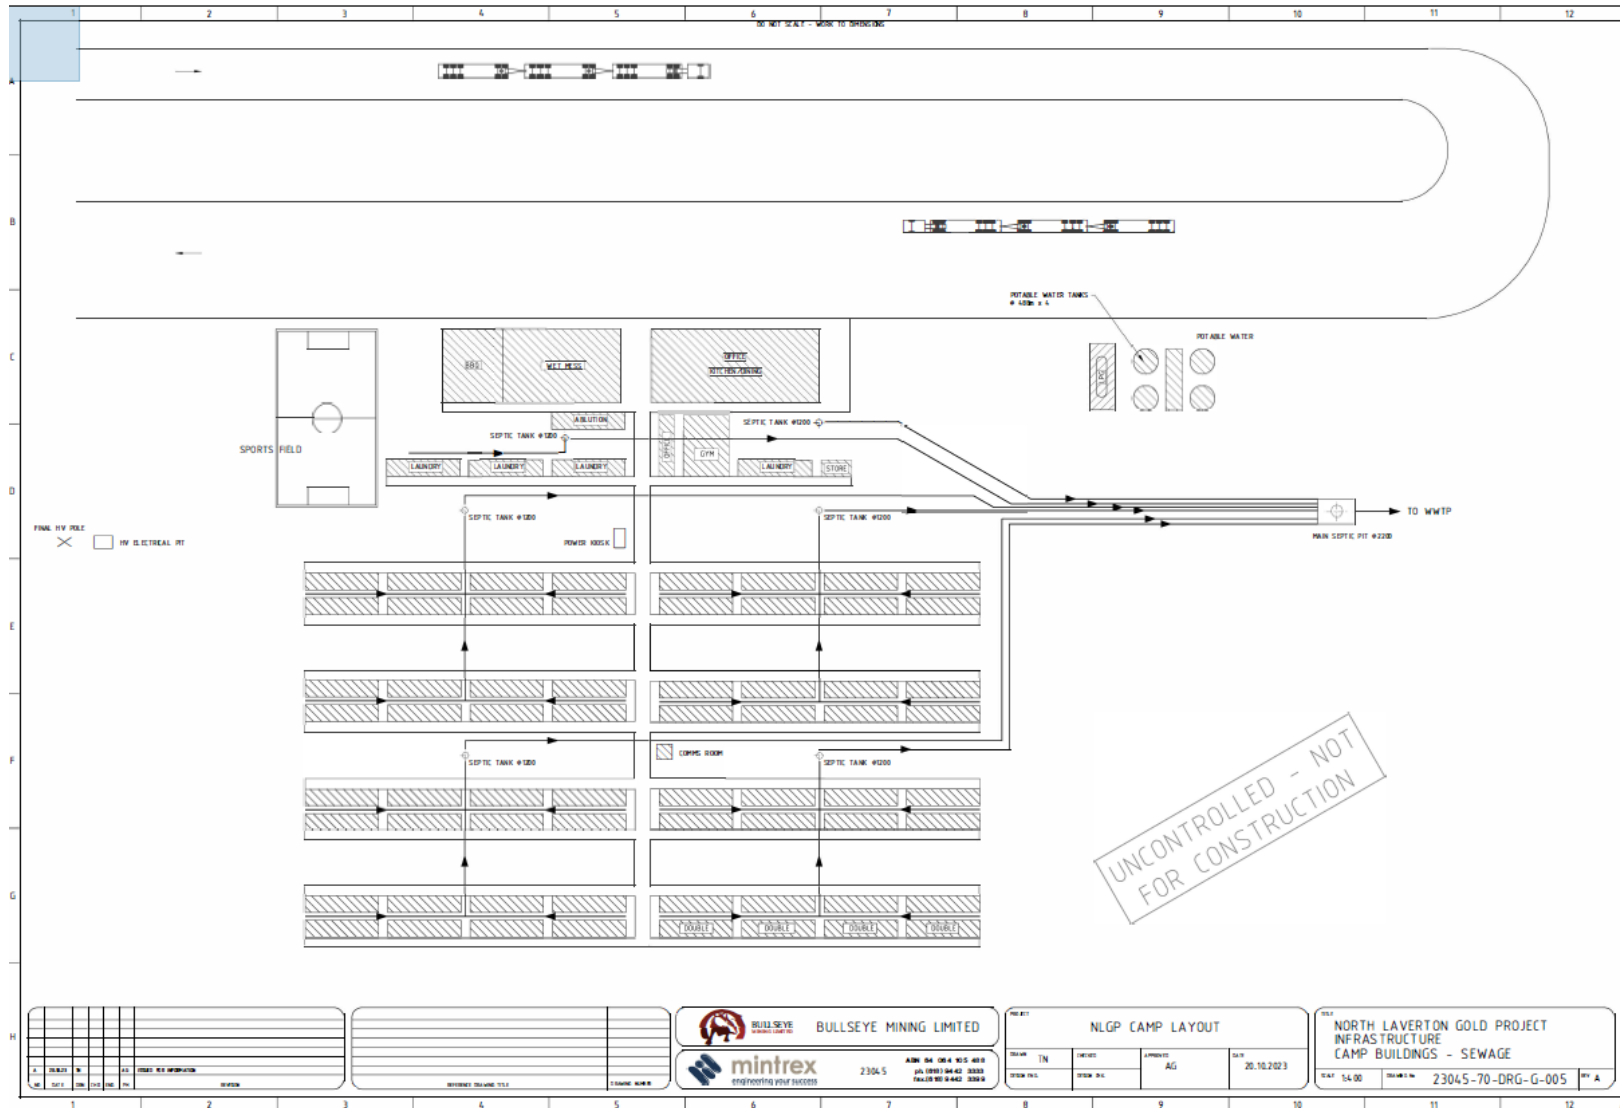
Camp buildings layout - indicating separation tank as septic pit
